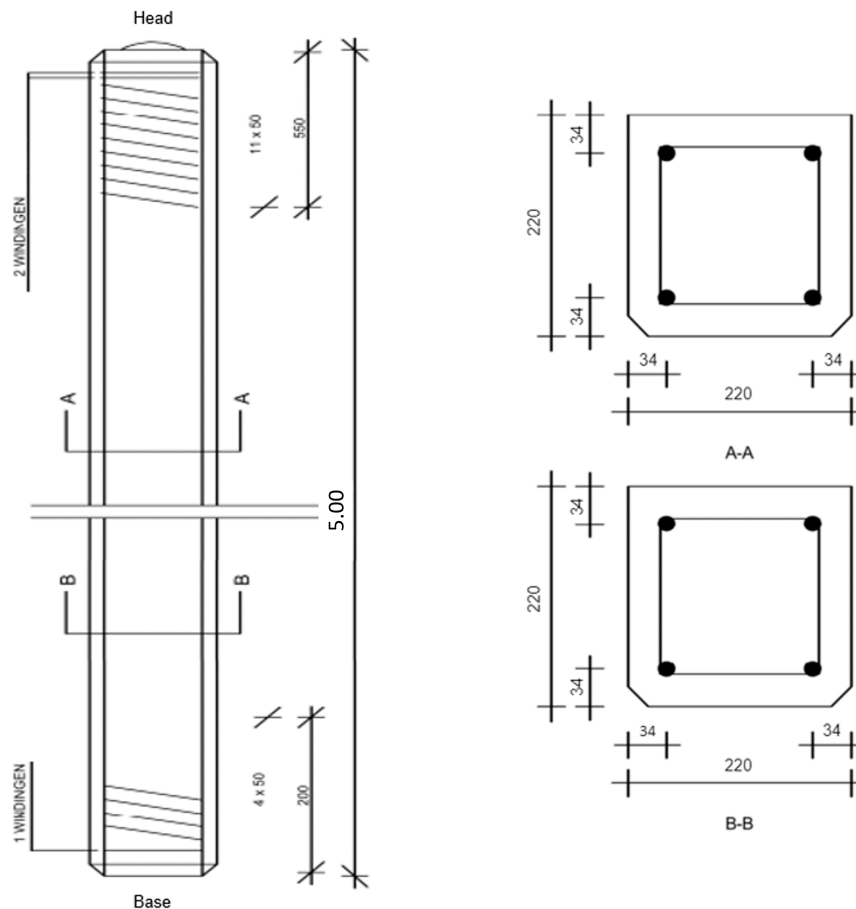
Design and dimensions prefabricated prestressed pile foundation Zwolle, with length 5.0 meters
